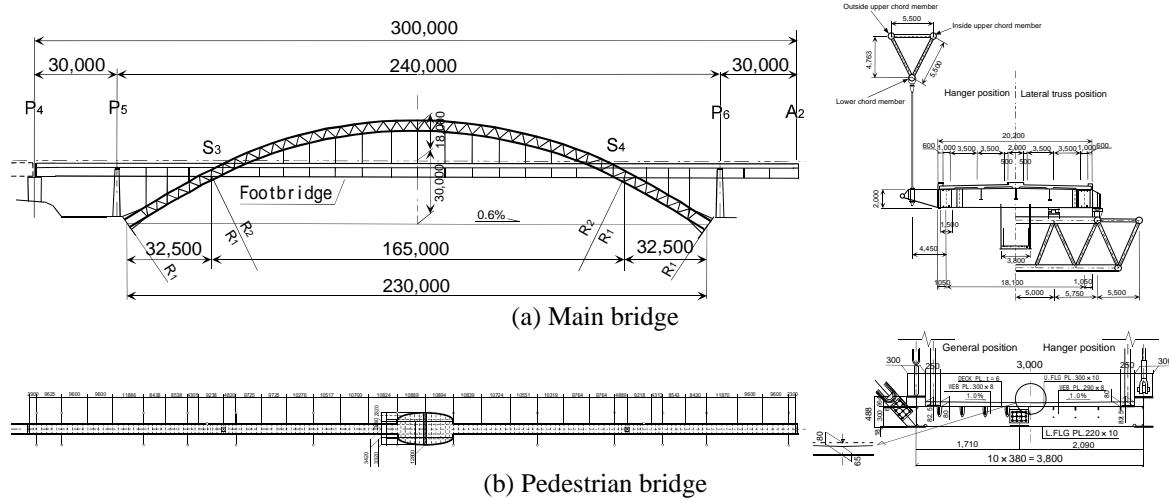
General view of the Second Saikai Bridge (unit: mm)
